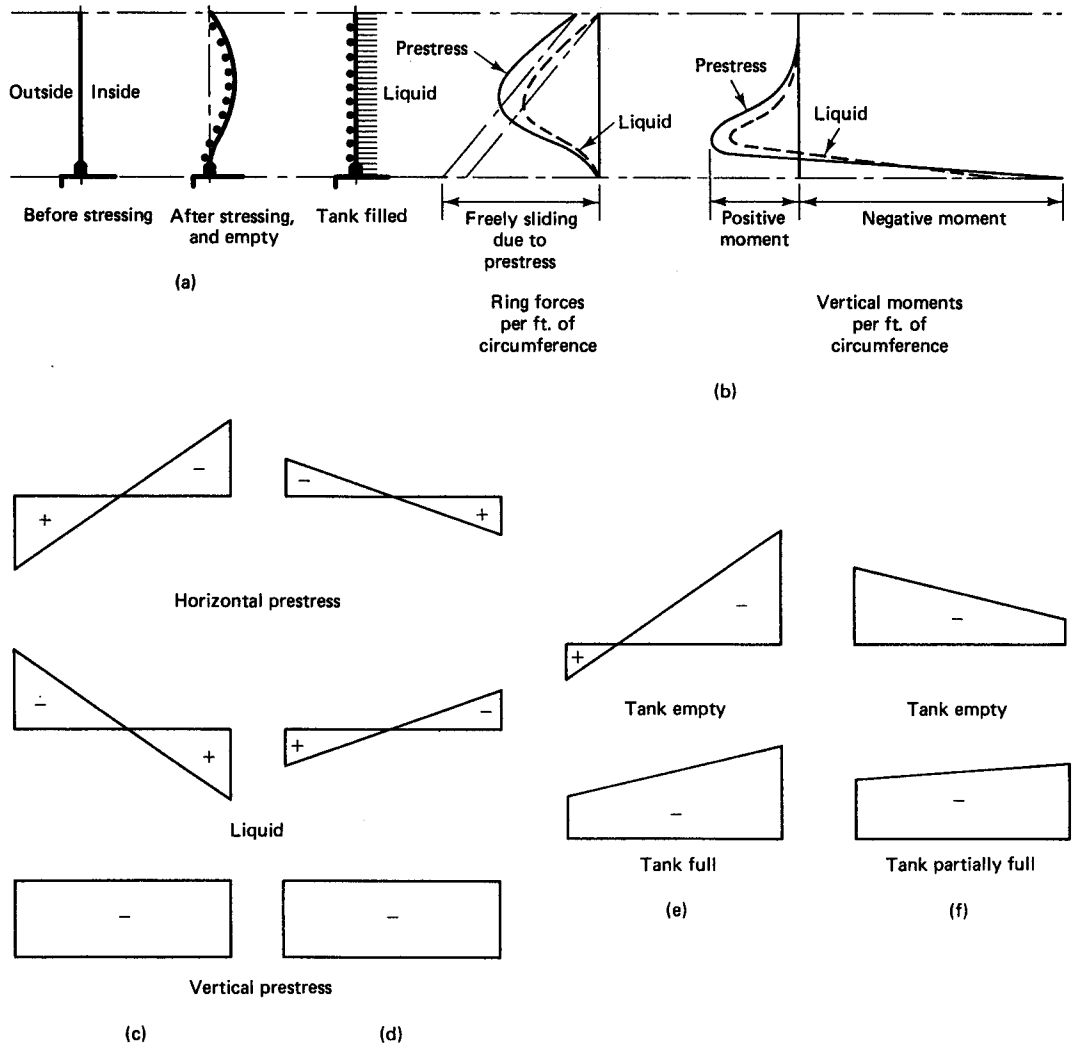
Hinged-base tank. (a) Deflected shape of tank wall. (b) Horizontal ring forces and vertical moments. (c) Concrete stresses across wall thickness. (d) Resultant wall stresses.
